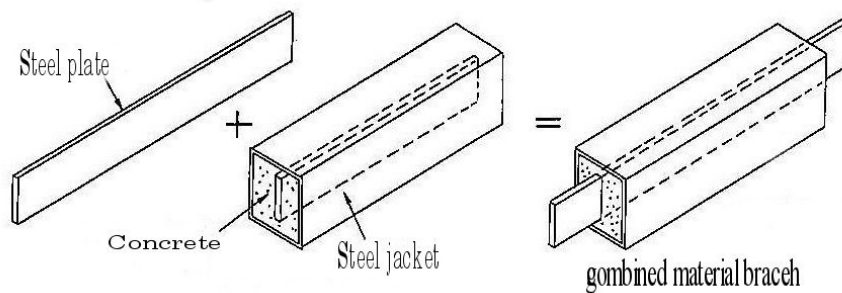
Schematic drawing of “combined material brace” or “un-bonded brace”
